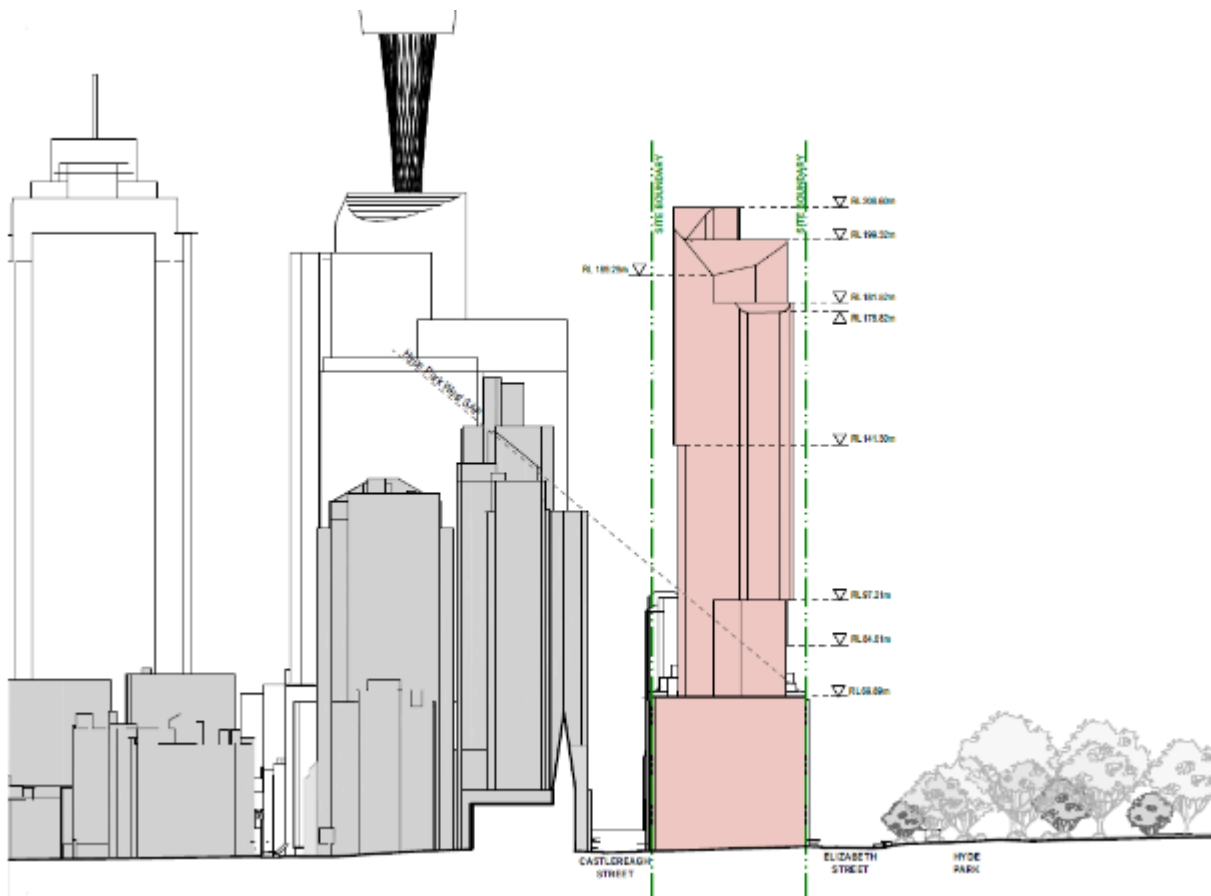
| Proposed south elevation (Source: Ethos Urban modification plans)
